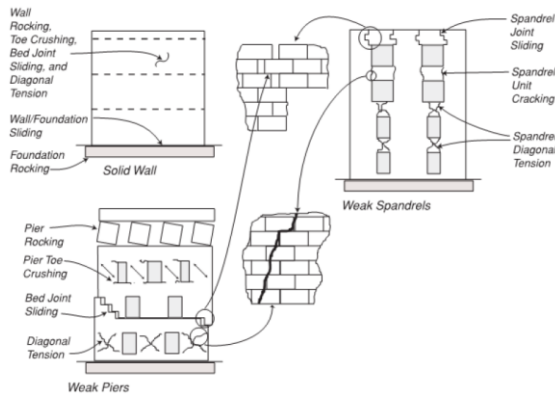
Typical failure modes of an in-plane loaded URM wall [20]
